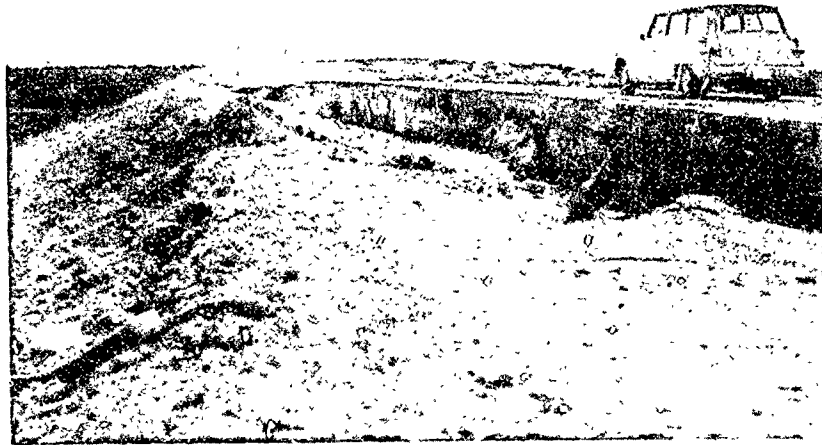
Crest of dam, slide area about sta 55+00, Oct 61.
